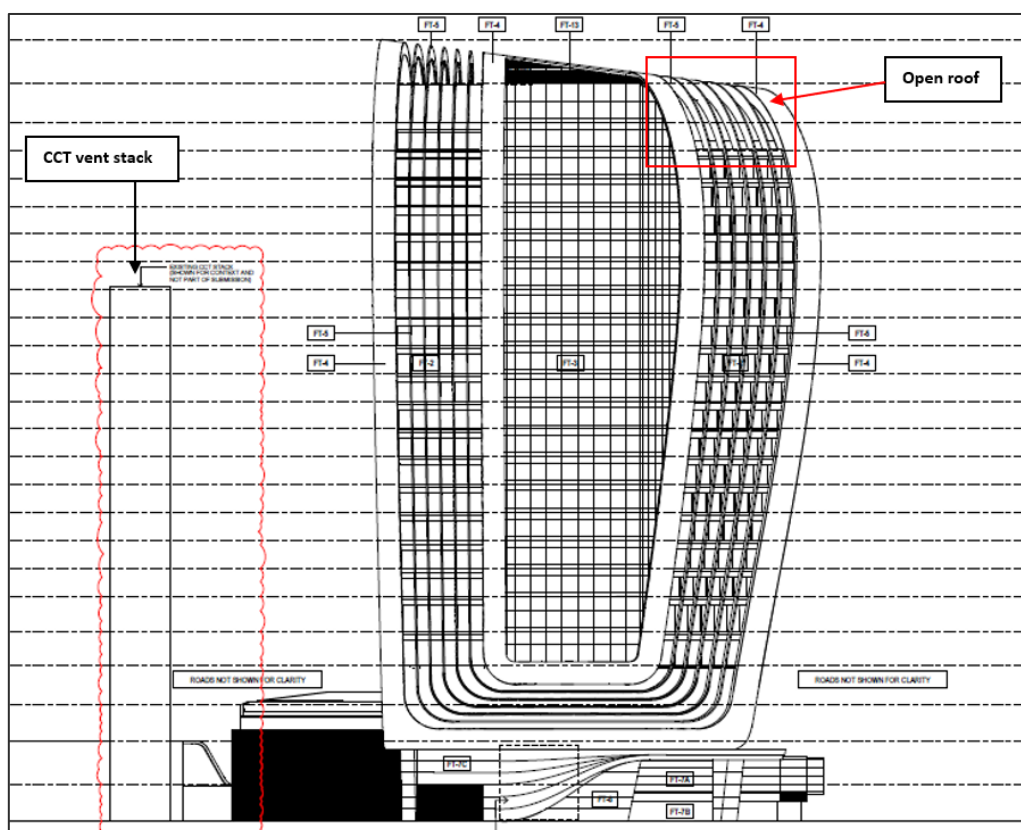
| Proposed north elevation showing open roof and location of Cross City Tunnel (CCT) vent stack (Base source: Applicant's Architectural drawings).
